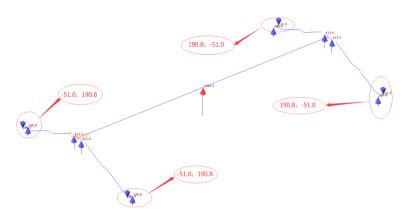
Example of the dead load reaction force at the landing end of the I-shaped footbridge stairway (kN)
